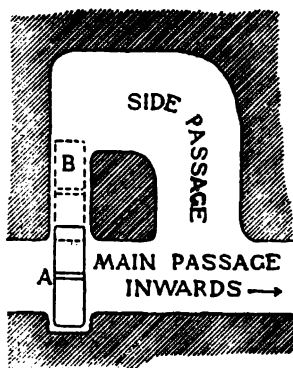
Diagrammatic Plan of Stone Door in an underground gallery in Cappadocia.
